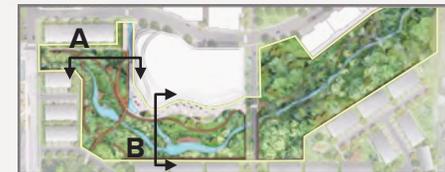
The Creekway Vision at the Cherry Street bridge includes an elevated bridge and creekside paths flanking the restored creek edge.
